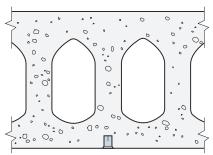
Hollow-Core Concrete Panel (anchor can be installed below web or hollow core)
